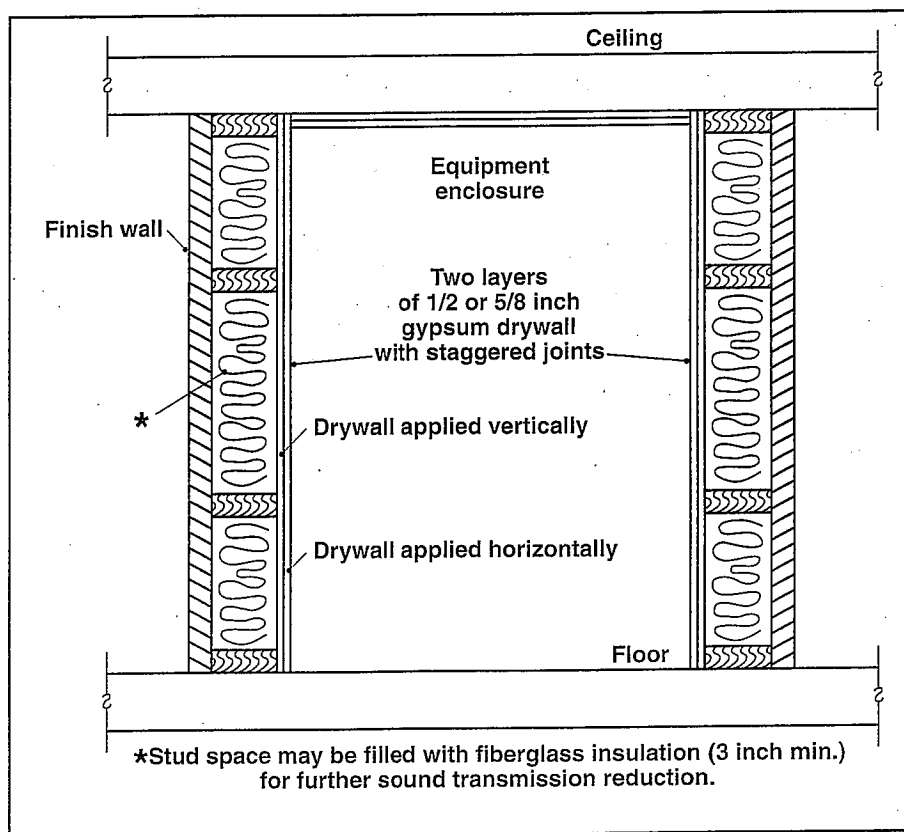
Line-drawing elevation cross section of closet enclosure showing two (2) layers of gypsum dry wall applied to side walls and ceiling.
